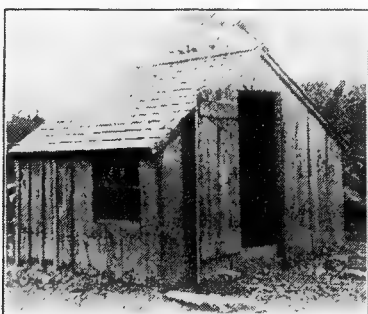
Small house used by author. Battened only on back and rear half of sides
